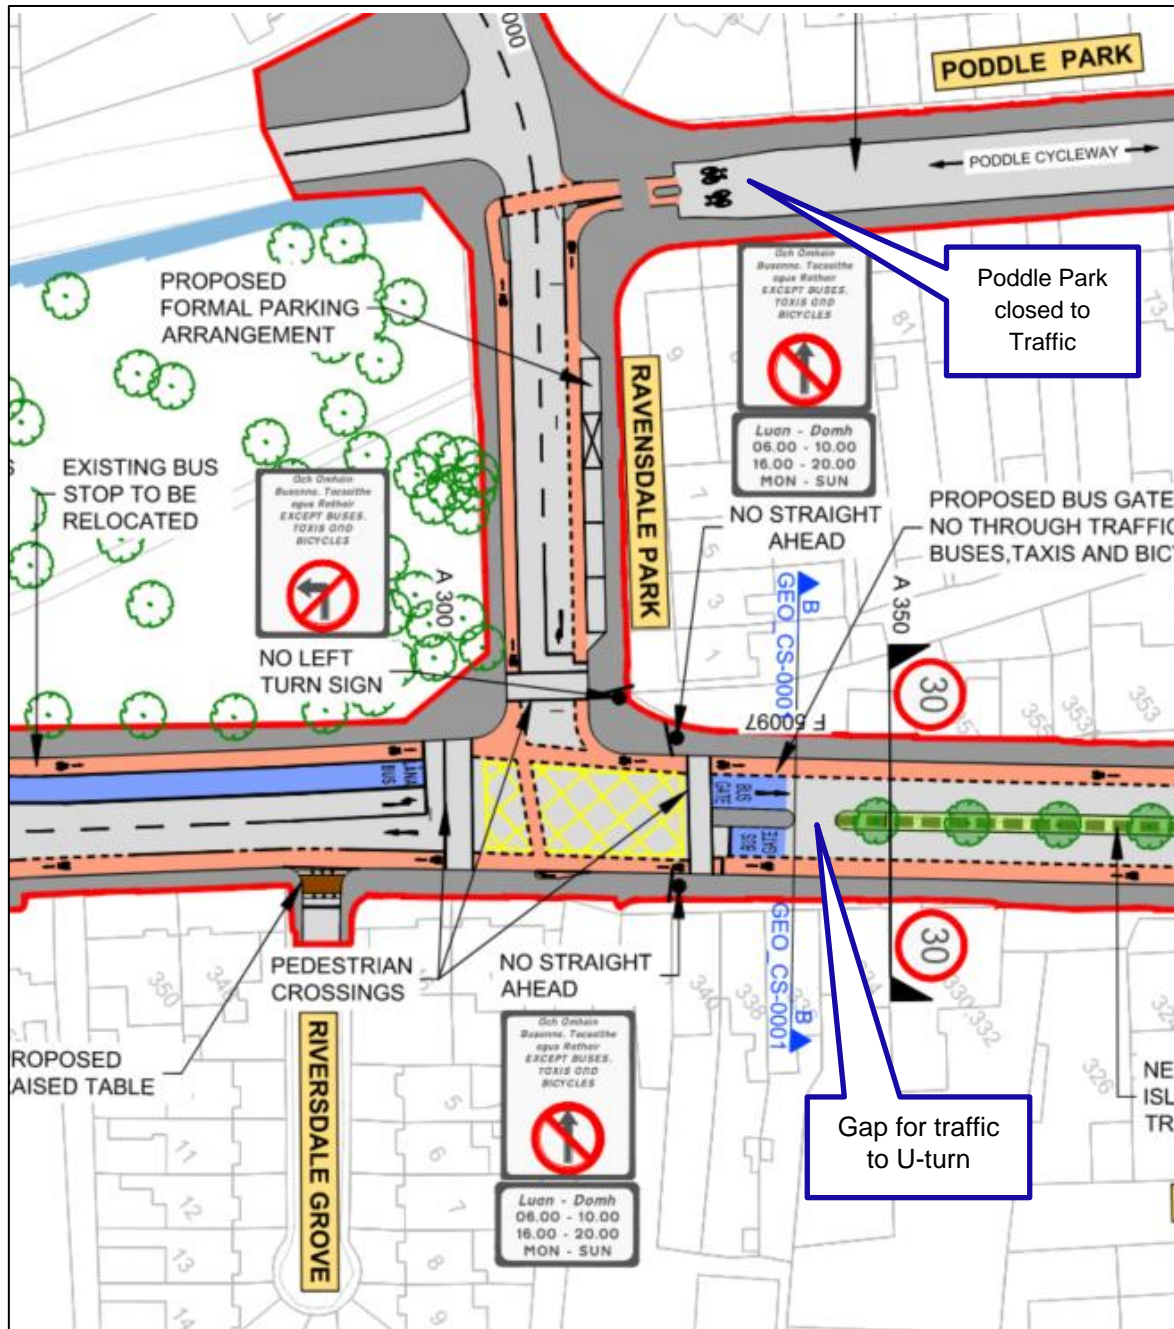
Proposed Bus Gate No.1 at junction of Kimmage Road Lower and Ravensdale Park
